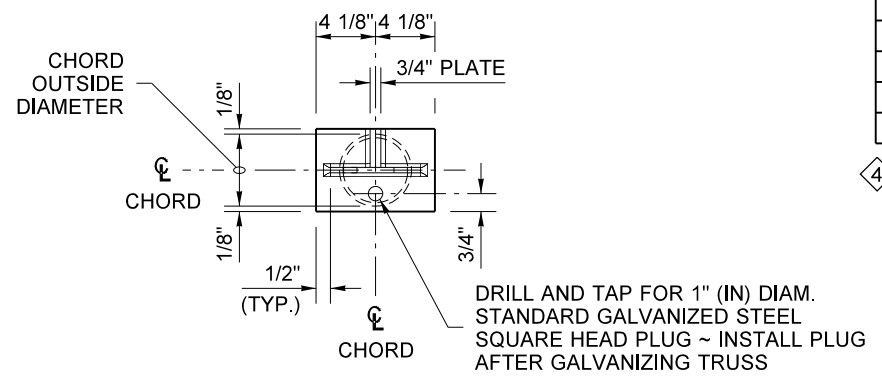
DETAILS NOT SHOWN ARE SAME AS CHORD TO END POST CONNECTION TYPE R,
